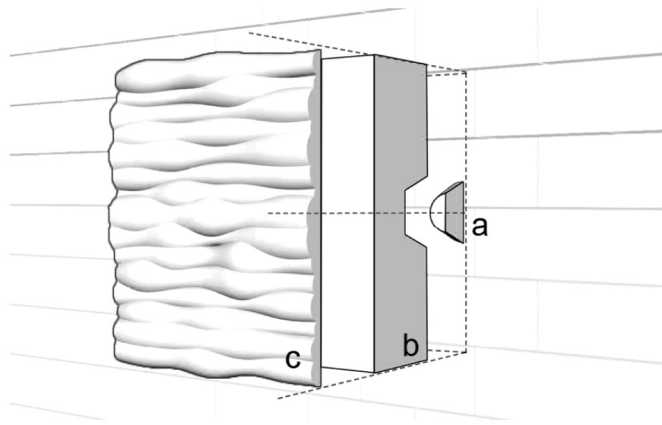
Mono-material insulation system onto bare wall element: anchor (a), insulation (b), designed surface finish (c).
